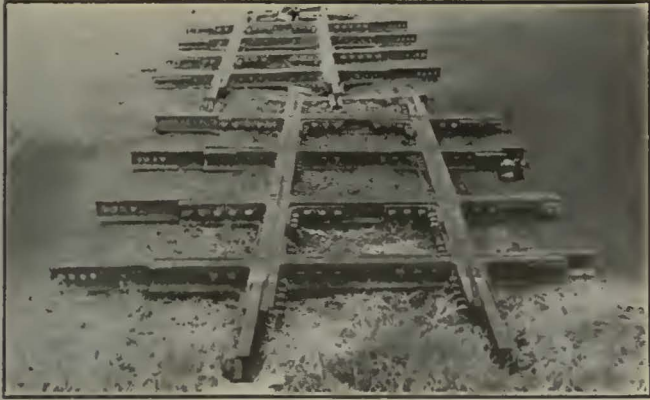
CLEVELAND NOISELESS CROSSING IN TWO PIECES READY FOR INSTALLATION
